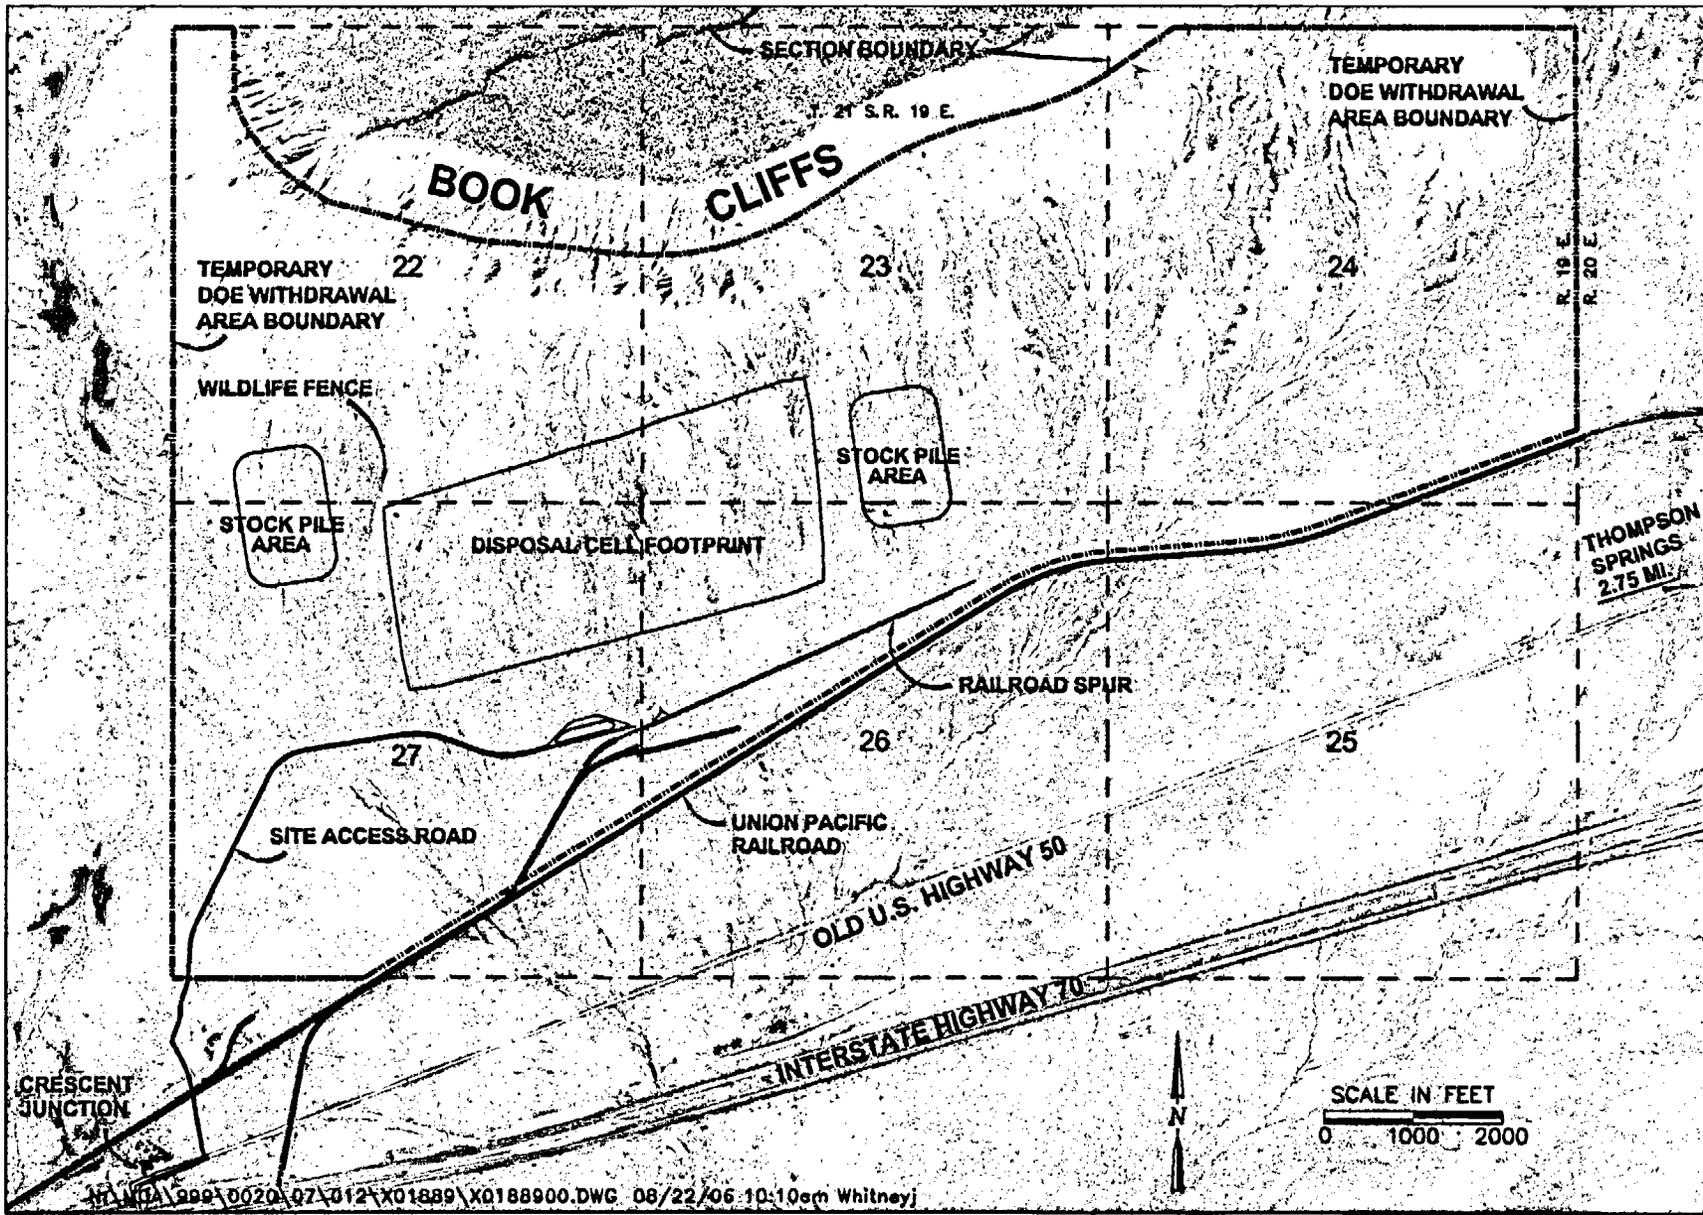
Crescent Junction Disposal Cell Footprint and Existing and Proposed Site Features
